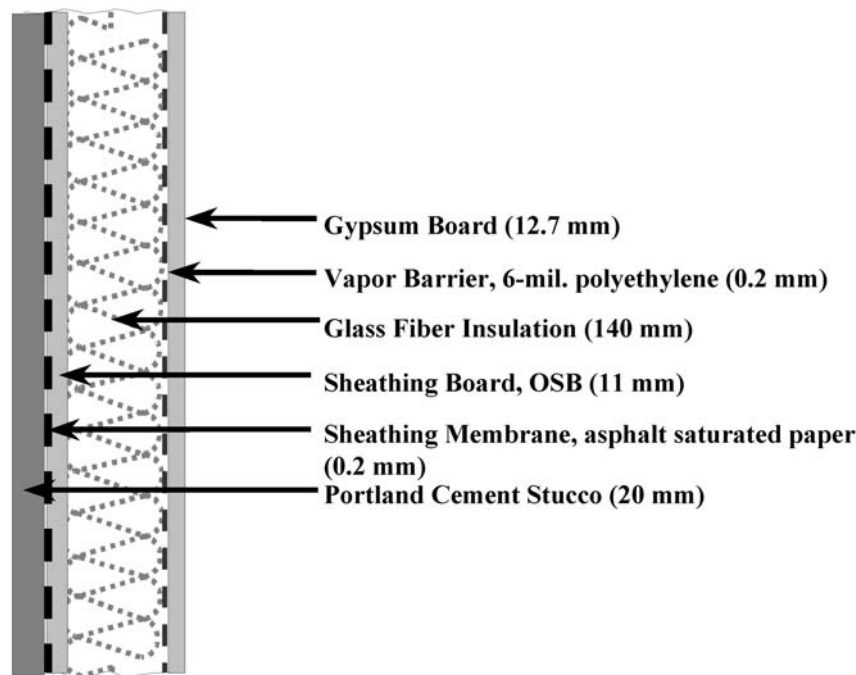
Schematic diagram of stucco wall cross-section under study.
